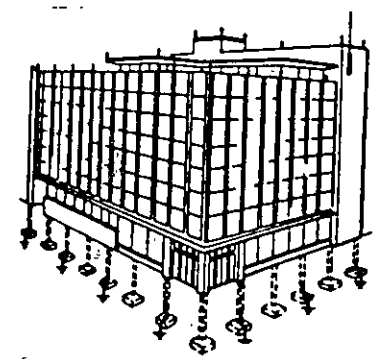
Steel building: Steel framing in tall buildings should be connected to air terminals. This type of structure requires special lightning protection.
